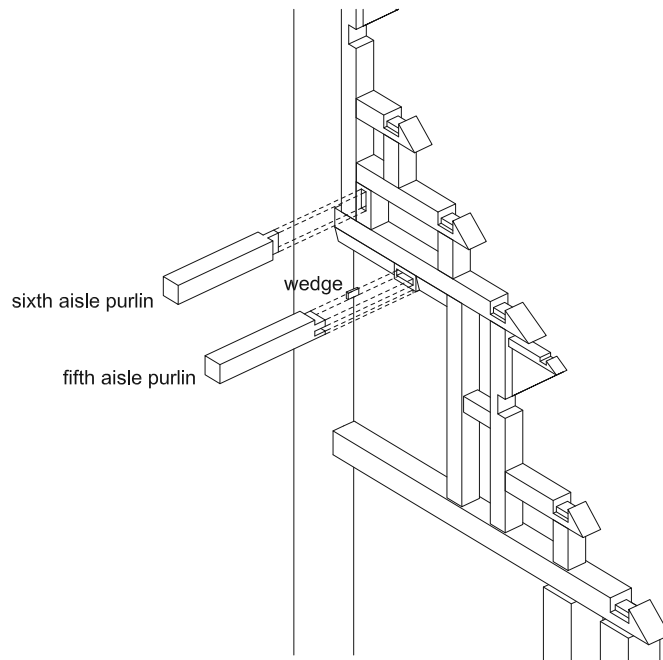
Purlins from the fourth bay meeting the fifth transverse frame in aisle roof structure
